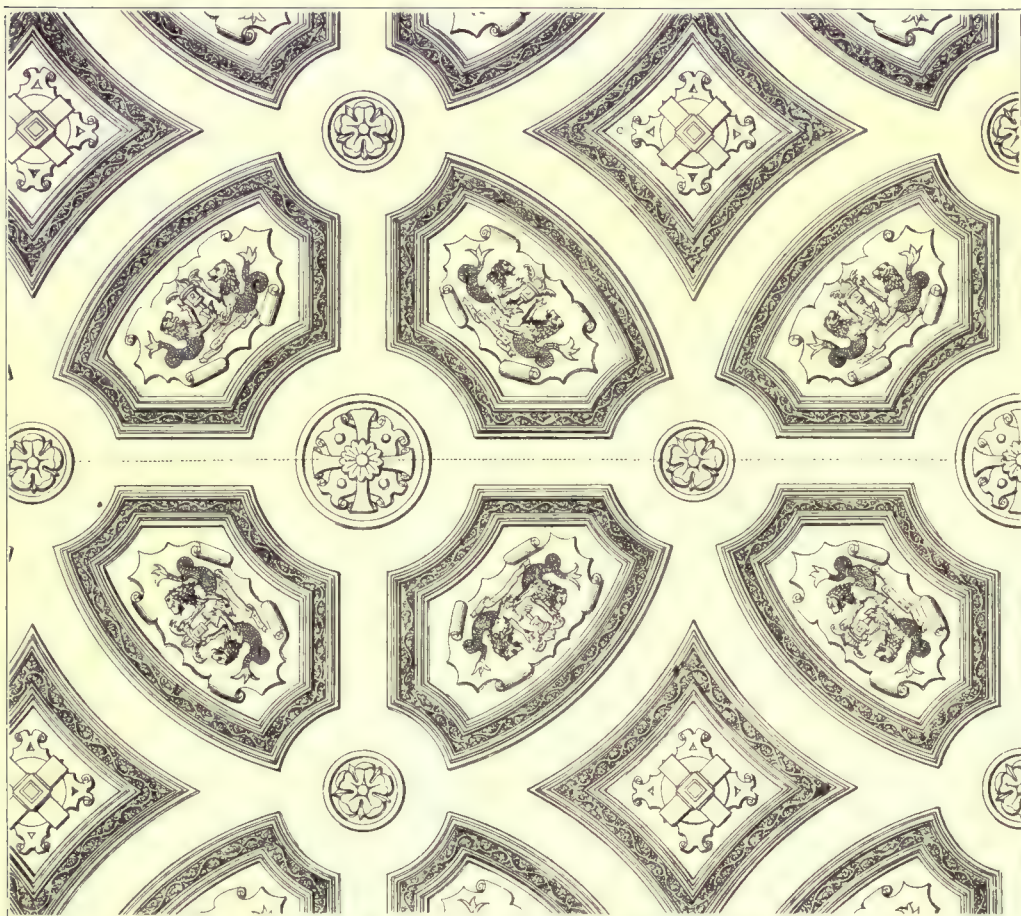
Plan of Portion of Dining-room Ceiling, Deane Hall, Northants.
